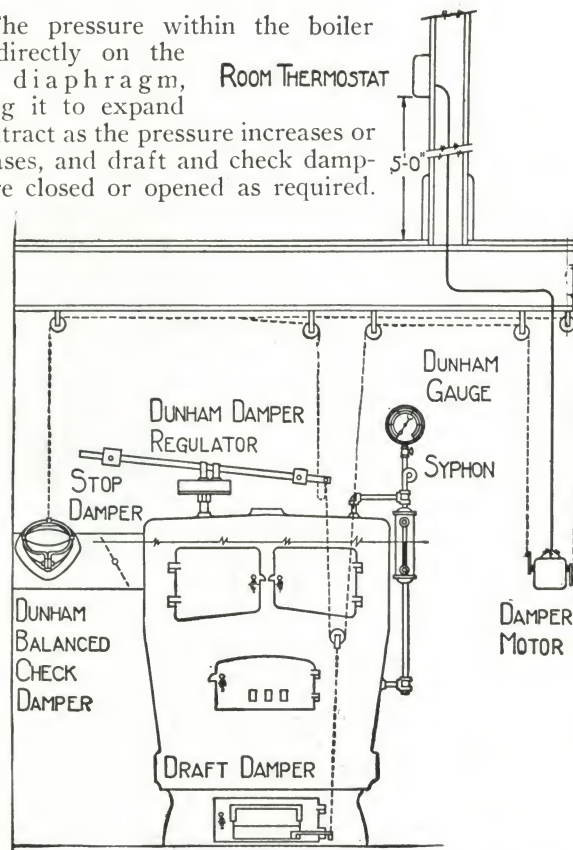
Typical Method of Installing Dunham Damper Regulator and Dunham Check Damper in Conjunction with an Electric Damper Motor Operated by a Room Thermostat
